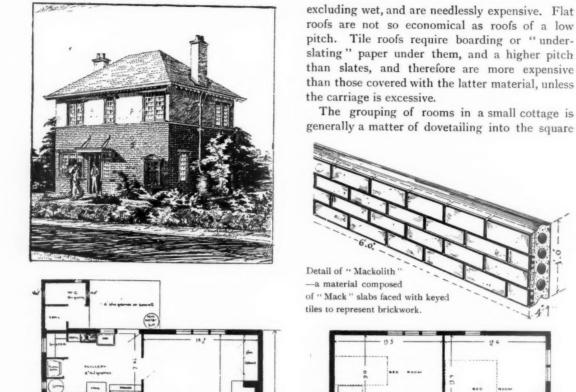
DETACHED COTTAGE CONSTRUCTED OF "MACKOLITH" TO FIRST-FLOOR WINDOW SILLS AND "MACK" PARTITION SLABS ROUGH-CASTED ABOVE, BY J. A. KING & CO. V. DUNKERLEY, ARCHITECT.
